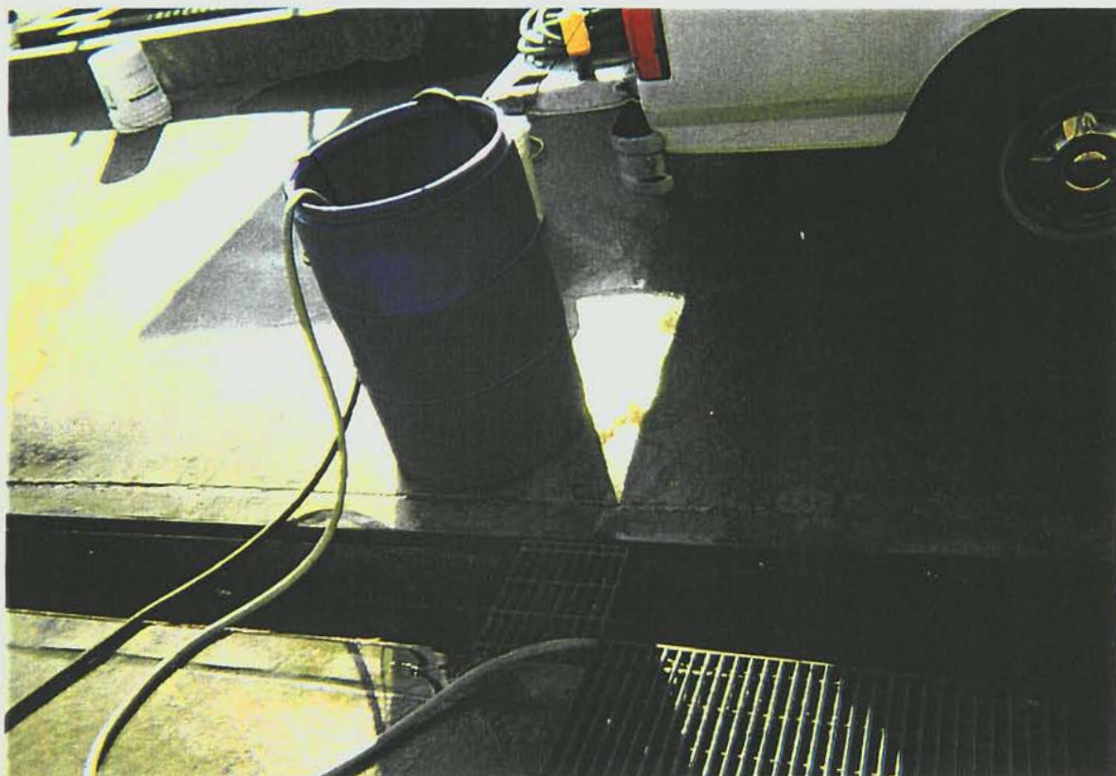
WASHRACK AREA TRENCH DURING DYE TESTING
